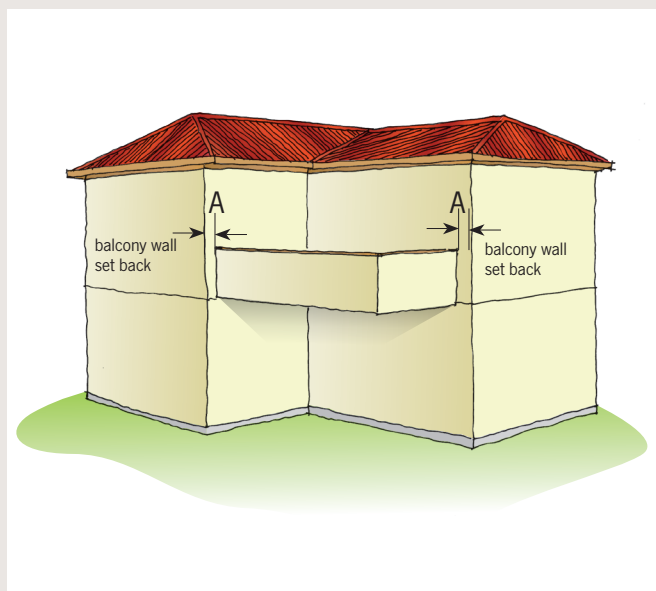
E2/AS1 requires enclosed framed balcony walls to be out of plane.
